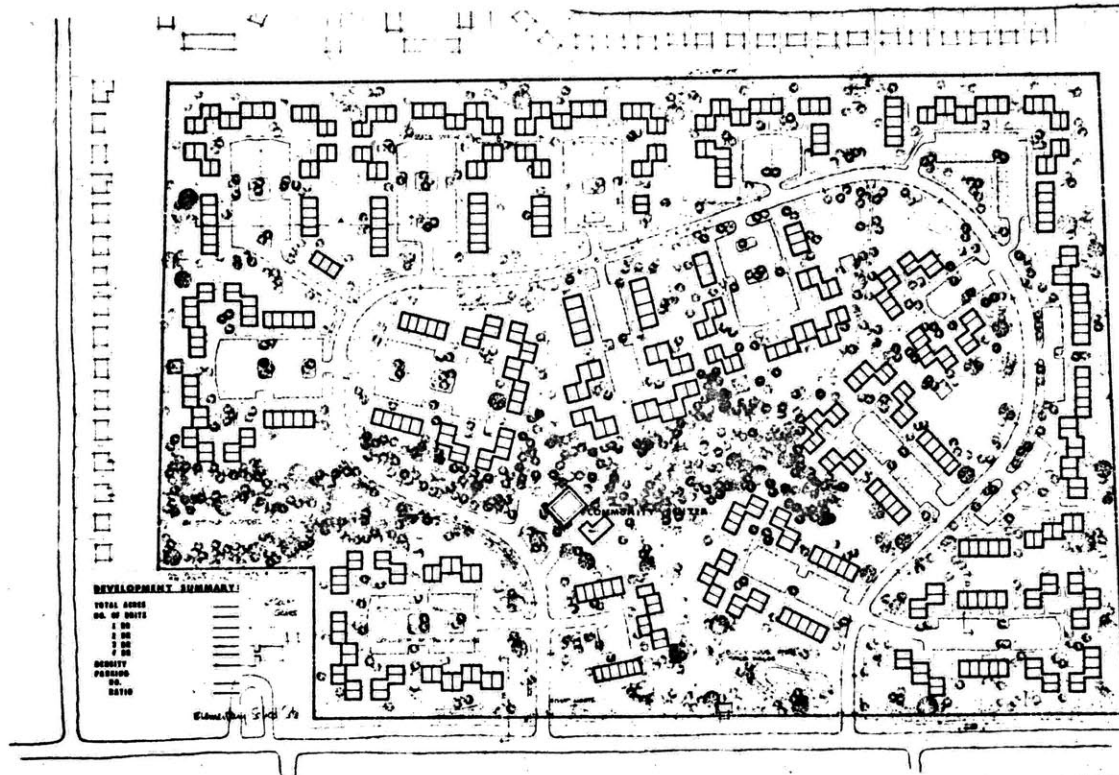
MSHDA SCHEMATIC SITE PLAN
